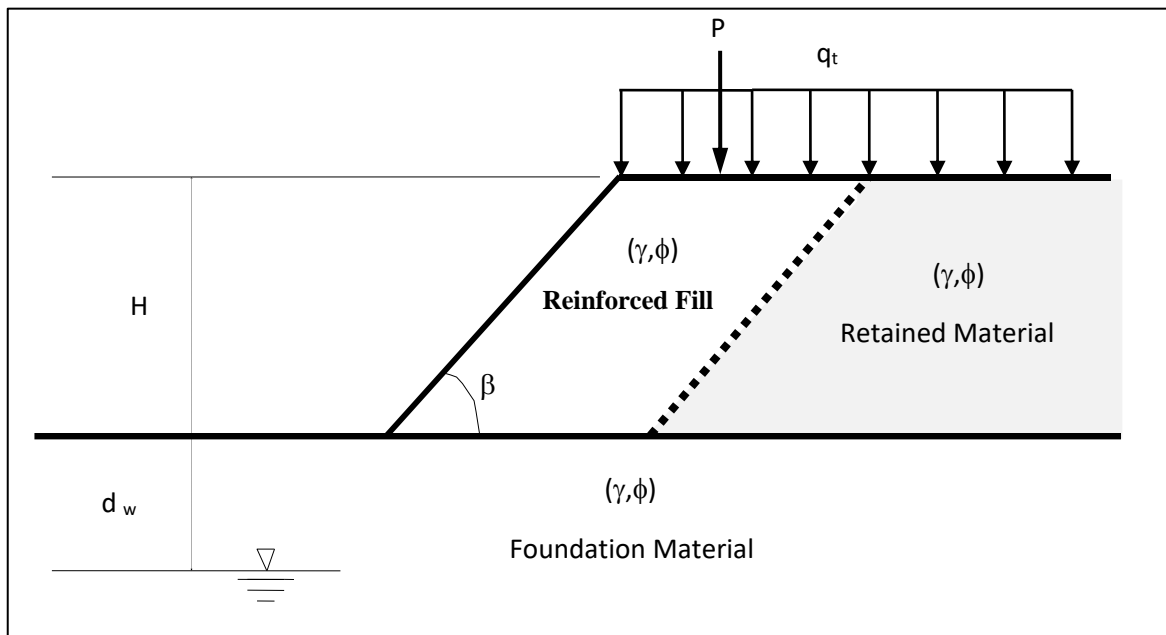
Geometric and Loading Requirements for GRS Slope
